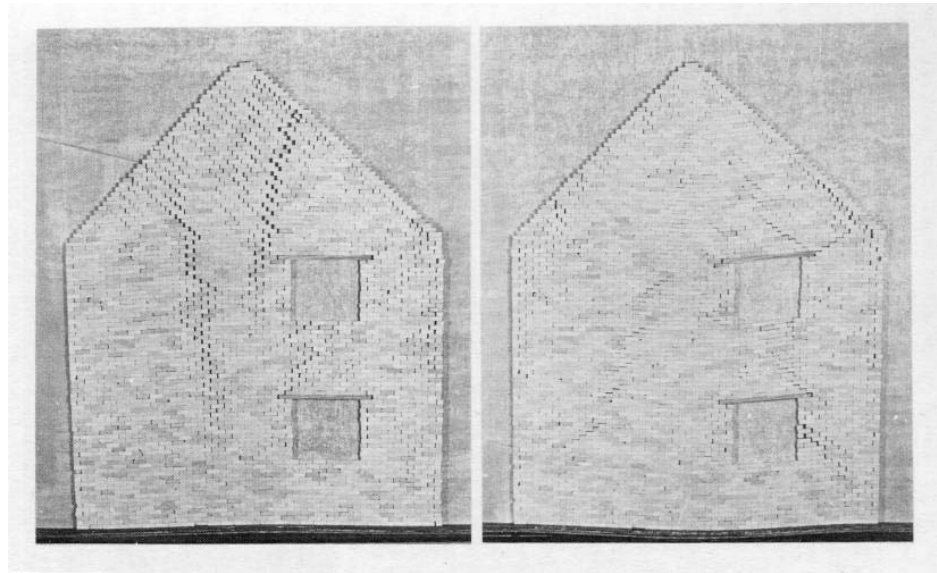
Model masonry facade subjected to hogging (left) and sagging (right) (after Cox, 1980)
